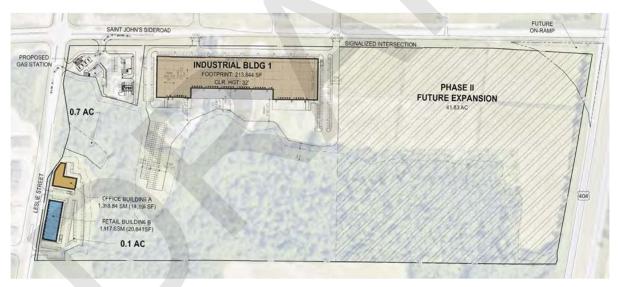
Proposed Site Plan (Ware Malcomb, 2018).
